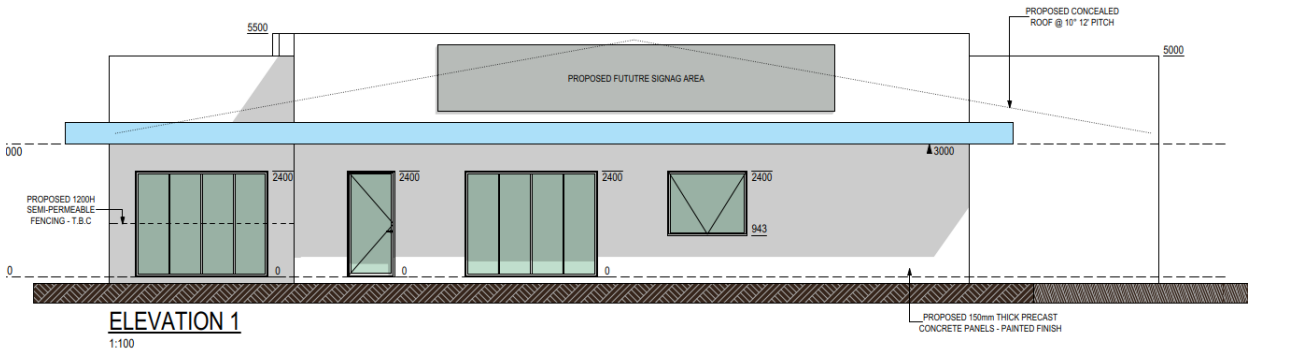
Swim School Elevation 1 (Laxxon Construction Design)
